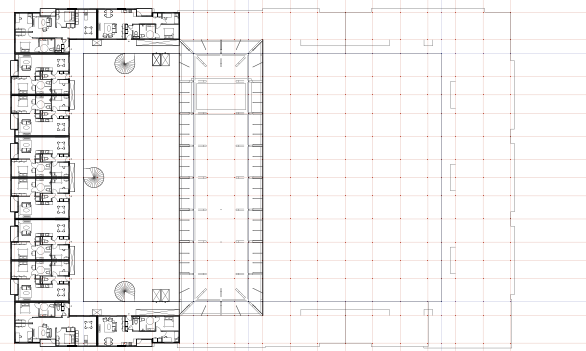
Building Floorplans (NTS: adapted from 1:100 original)
